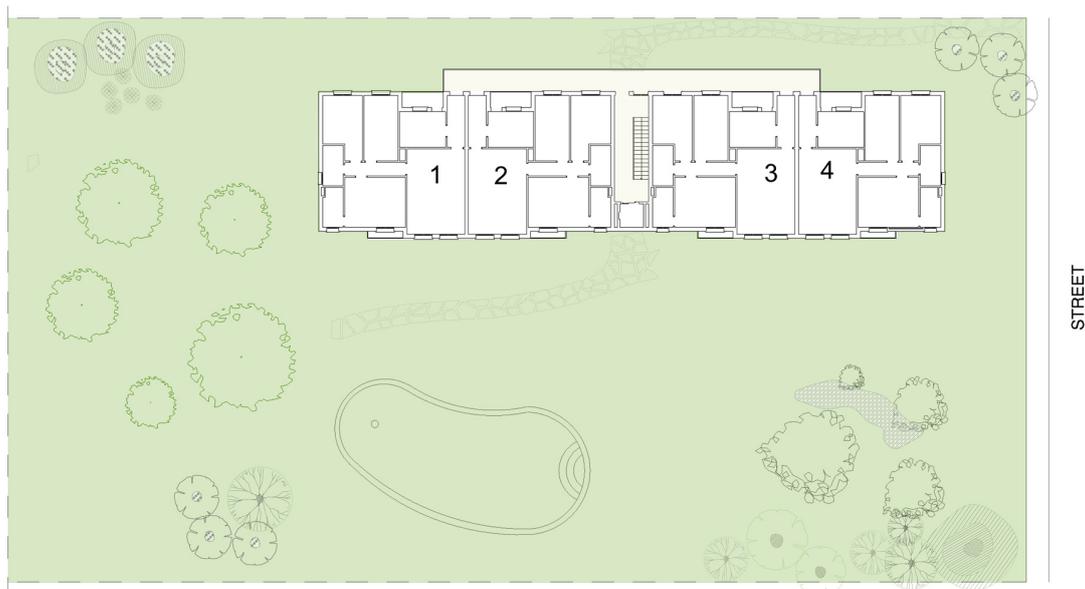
Floor plan detail of Alternative B building in its plot, with four units per floor, and a total of 16 dwelling units per building.
